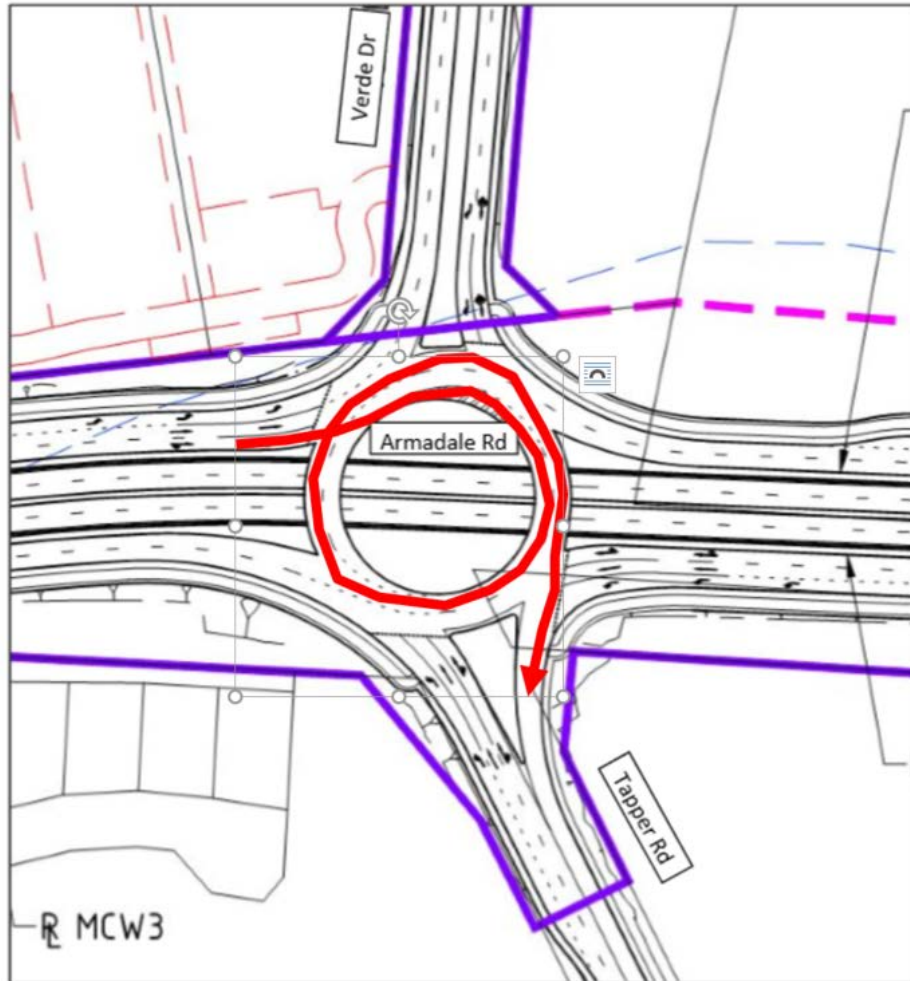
Armadale Road/Tapper Road/Verde Drive Intersection Layout
